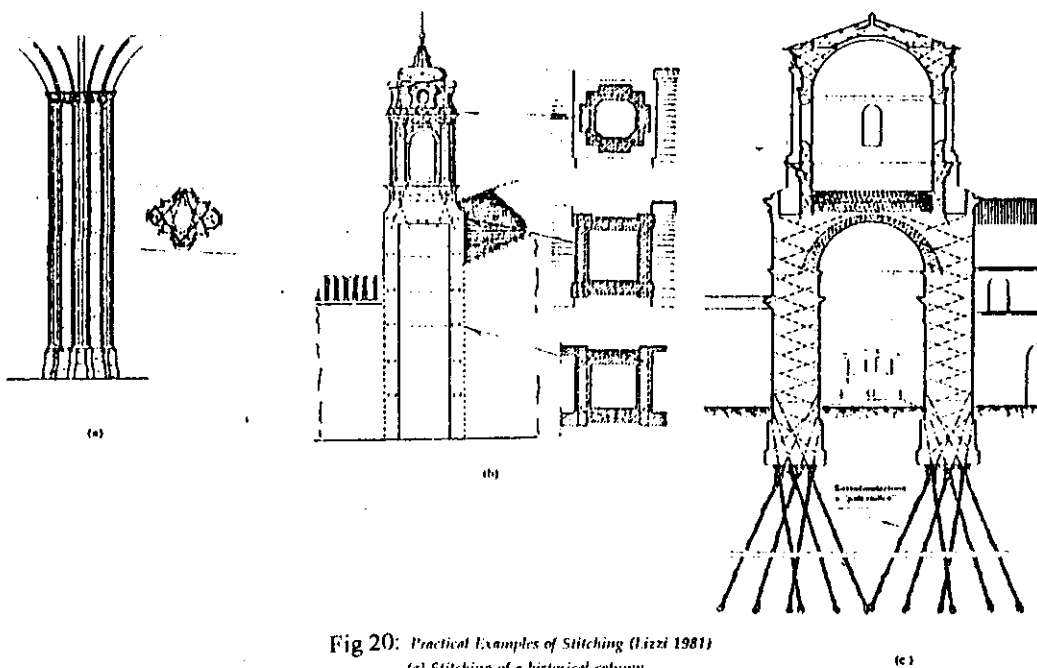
Practical Examples of Stitching (Lizzi 1981)
